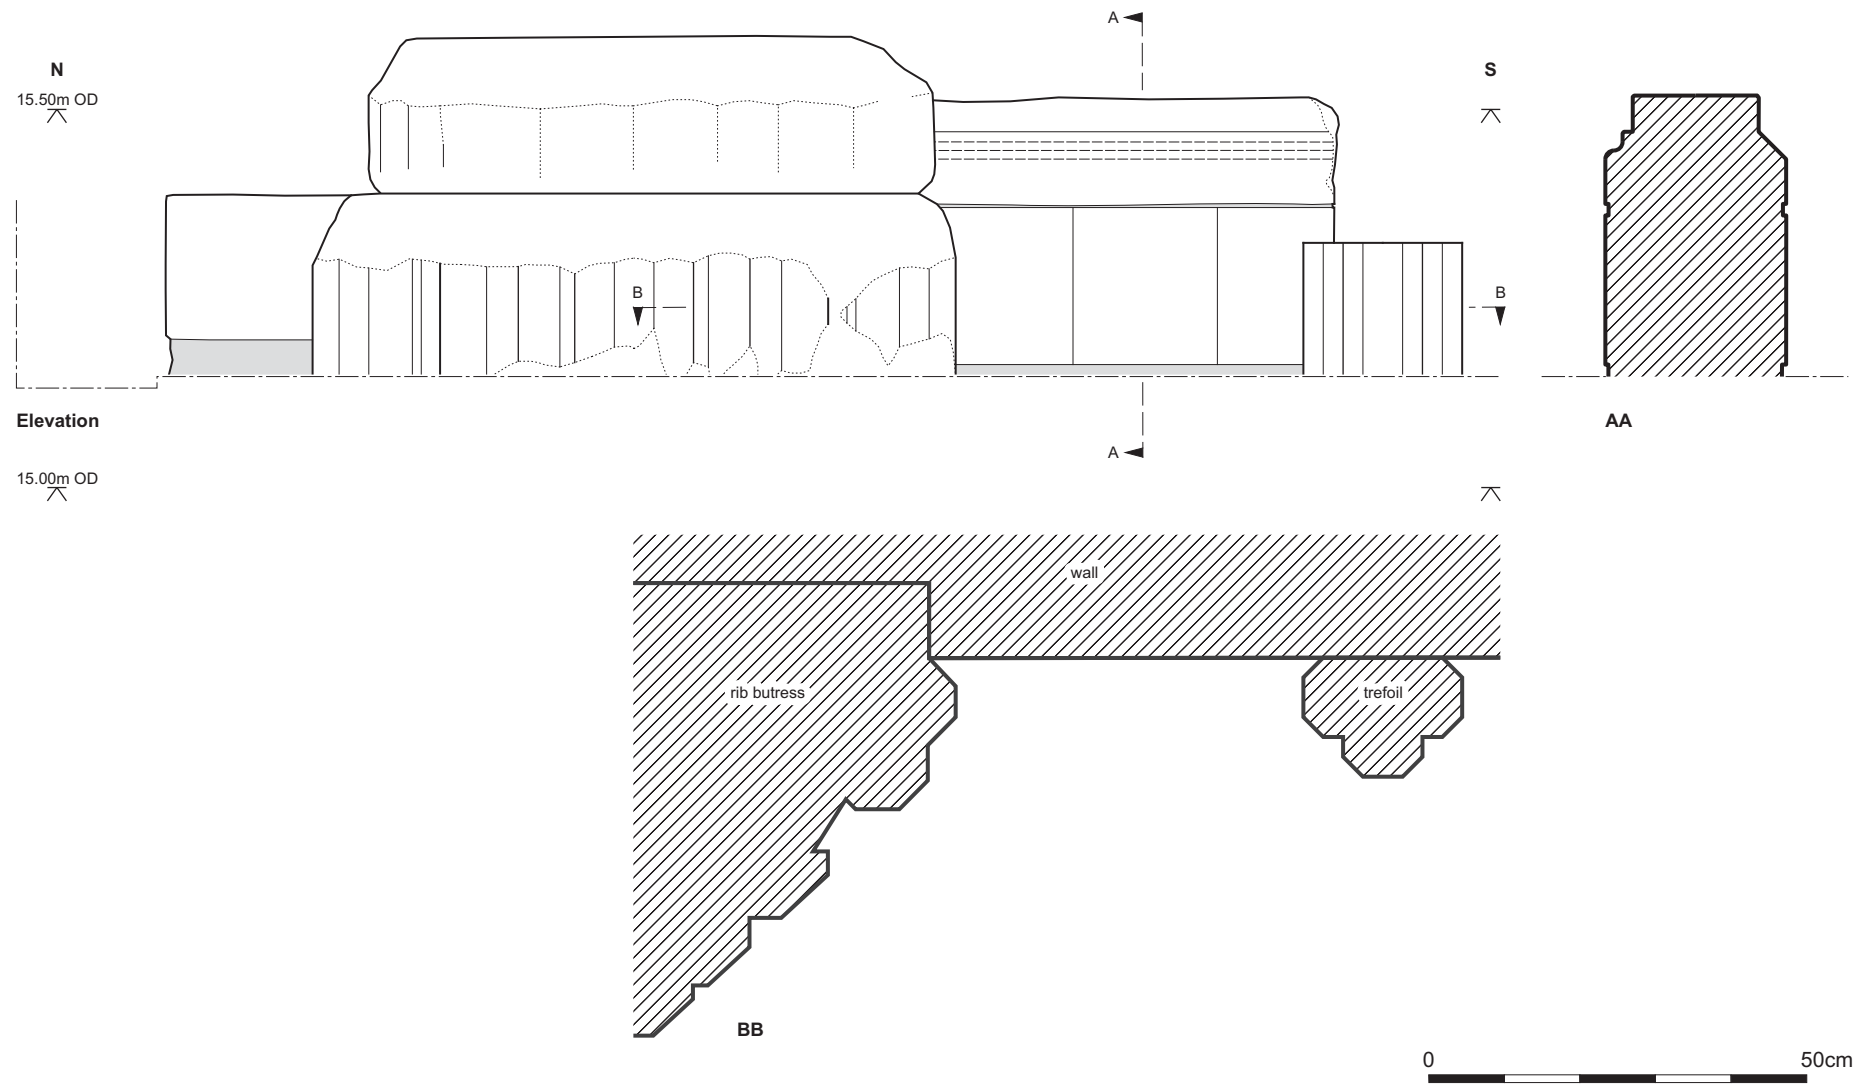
Elevation of and section through cloister wall [83], with details of trefoil-shaped shaft and composite attached pier base
